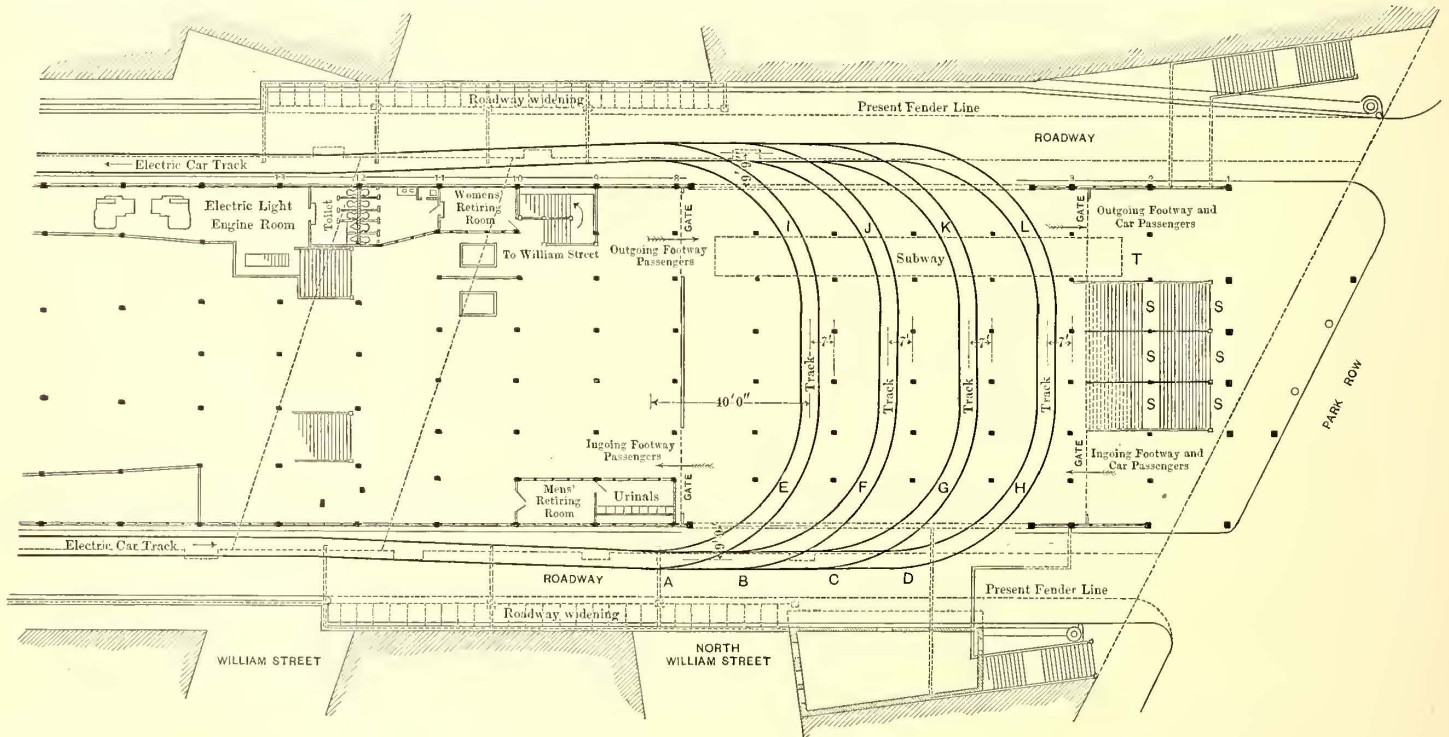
PLAN OF NEW YORK TERMINAL, SHOWING SURFACE RAILWAY LOOPS
